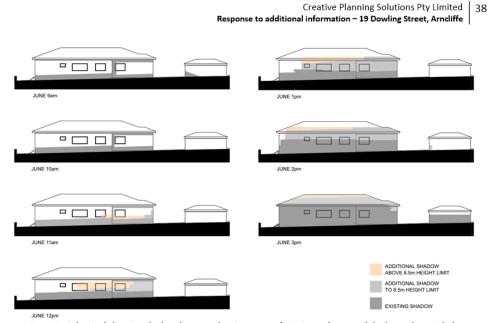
Submitted elevation shadow diagrams showing extent of existing and proposed shadows, along with the difference of a building with a compliant building height and that proposed under the latest amendment to the plans.
